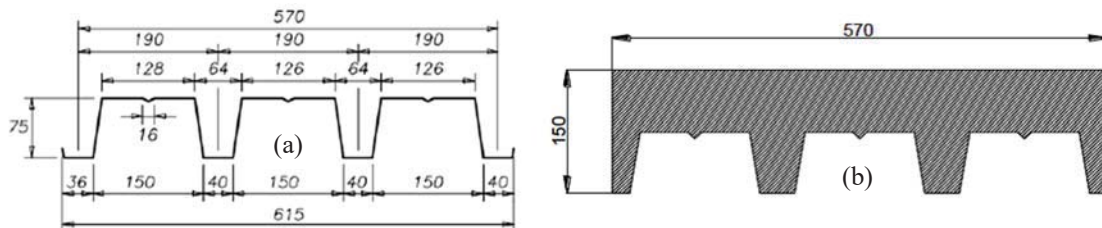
Cross-section of the deck: (a) corrugated sheet A75/P 570; (b) central span, with cast-in-situ concrete.
